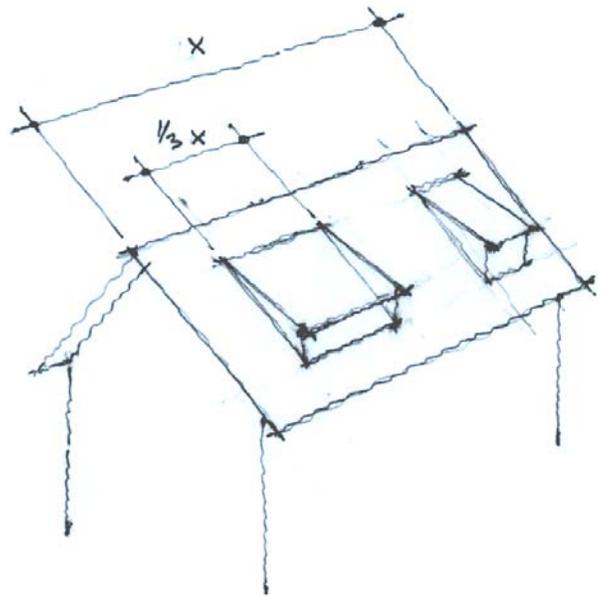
Any single dormer element shall not be longer than 1/3 the total length of the associated sloping roof plane
